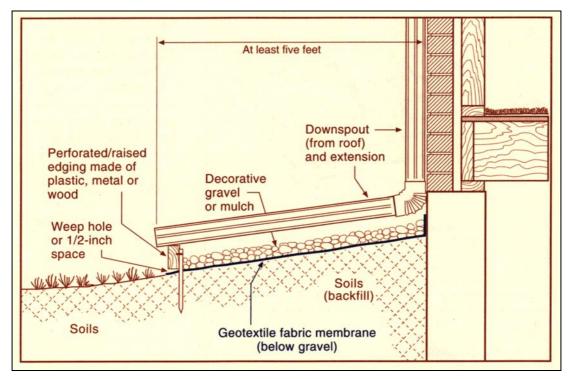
Landscaped runoff slope next to a house foundation. The roof drainage is carried by a downspout extension to a point beyond the slope. From Noe and others (1997); modified from Holtz and Hart (1978).
